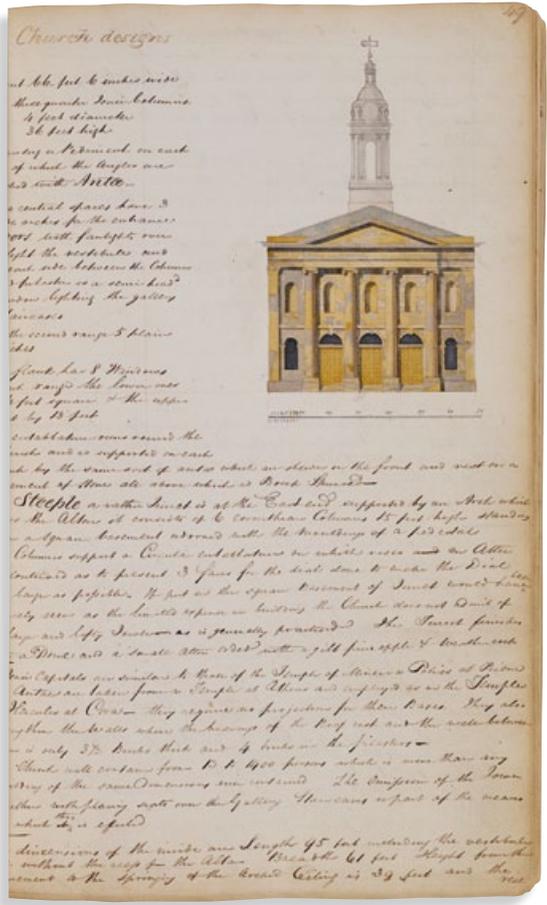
A Typical Commissioners' Church, sheet 49B. (Avery Classics)
